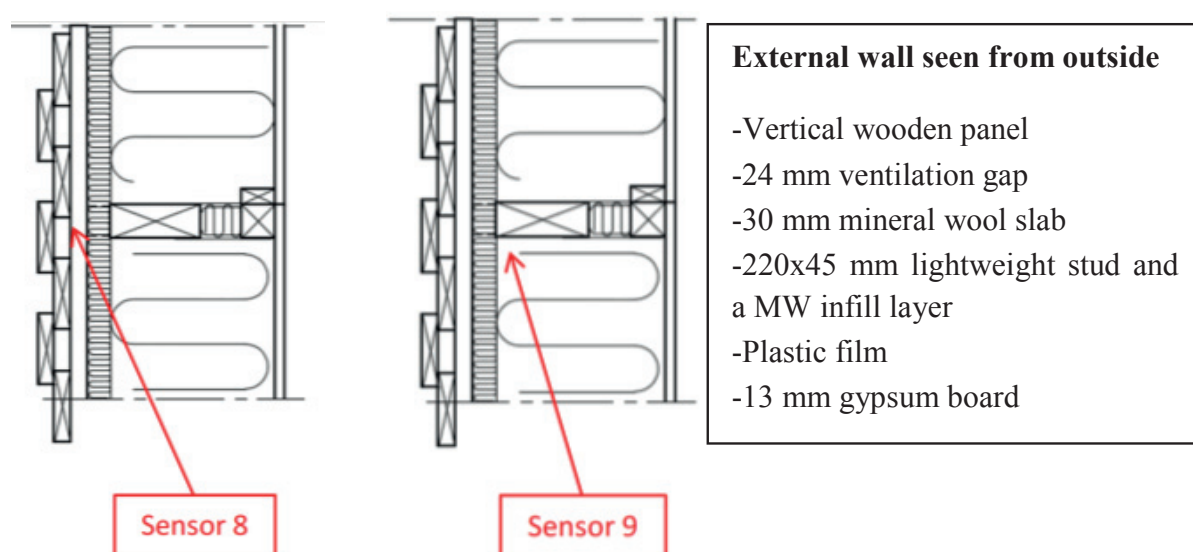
Horizontal cross-section of external wall with placement of sensors 8 and 9 in detached house in Falkenberg.
